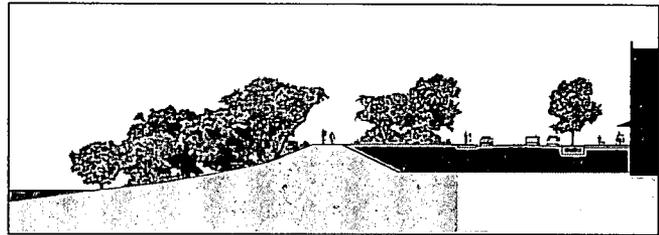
Berming behind levee at Township 9, allows parking garages built on existing grade with new fill graded to surround parking with elevated ground plane.
